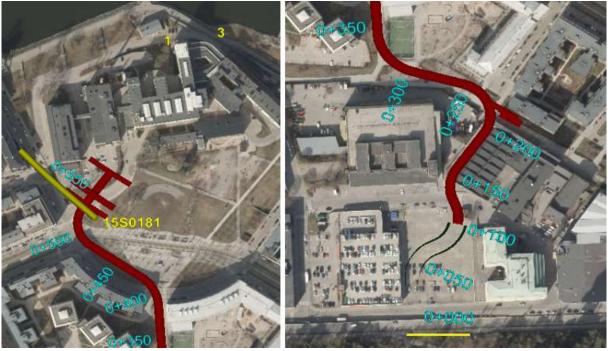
Hammarby Fabriksväg access tunnel marked in red, and the completed core borehole's location around the tunnel (FUT,2020).
